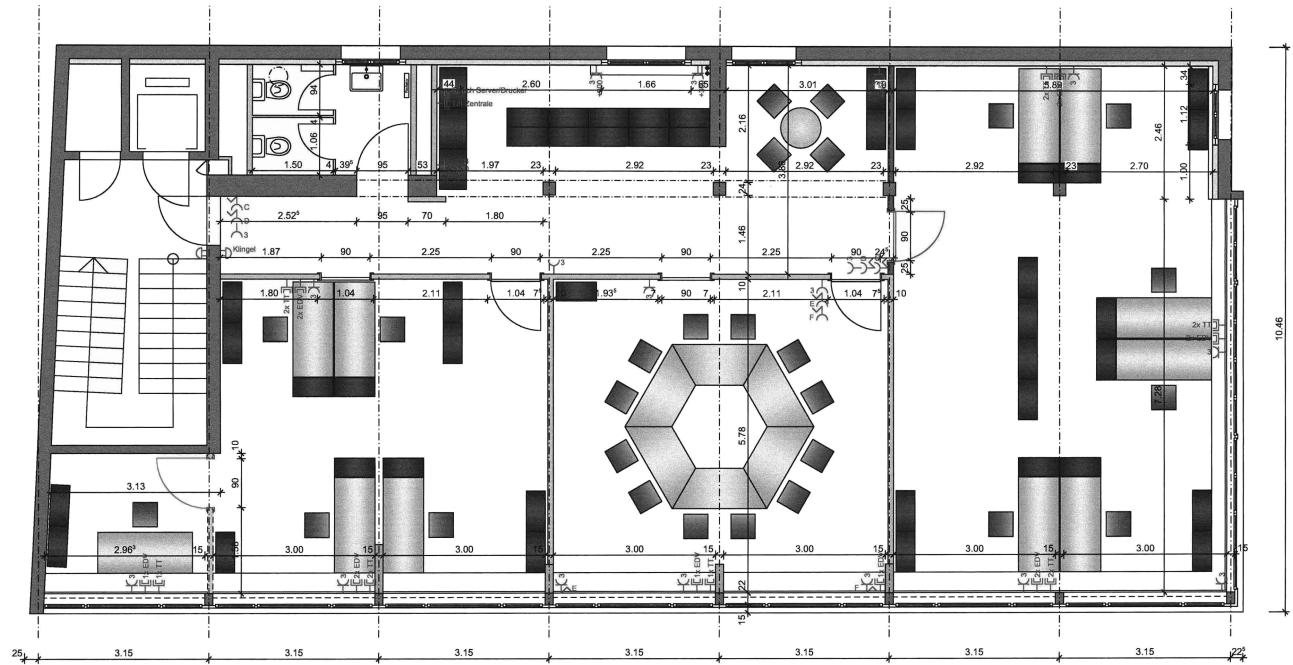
Floor plan of office building (Sumatra) ground floor to 2nd floor
